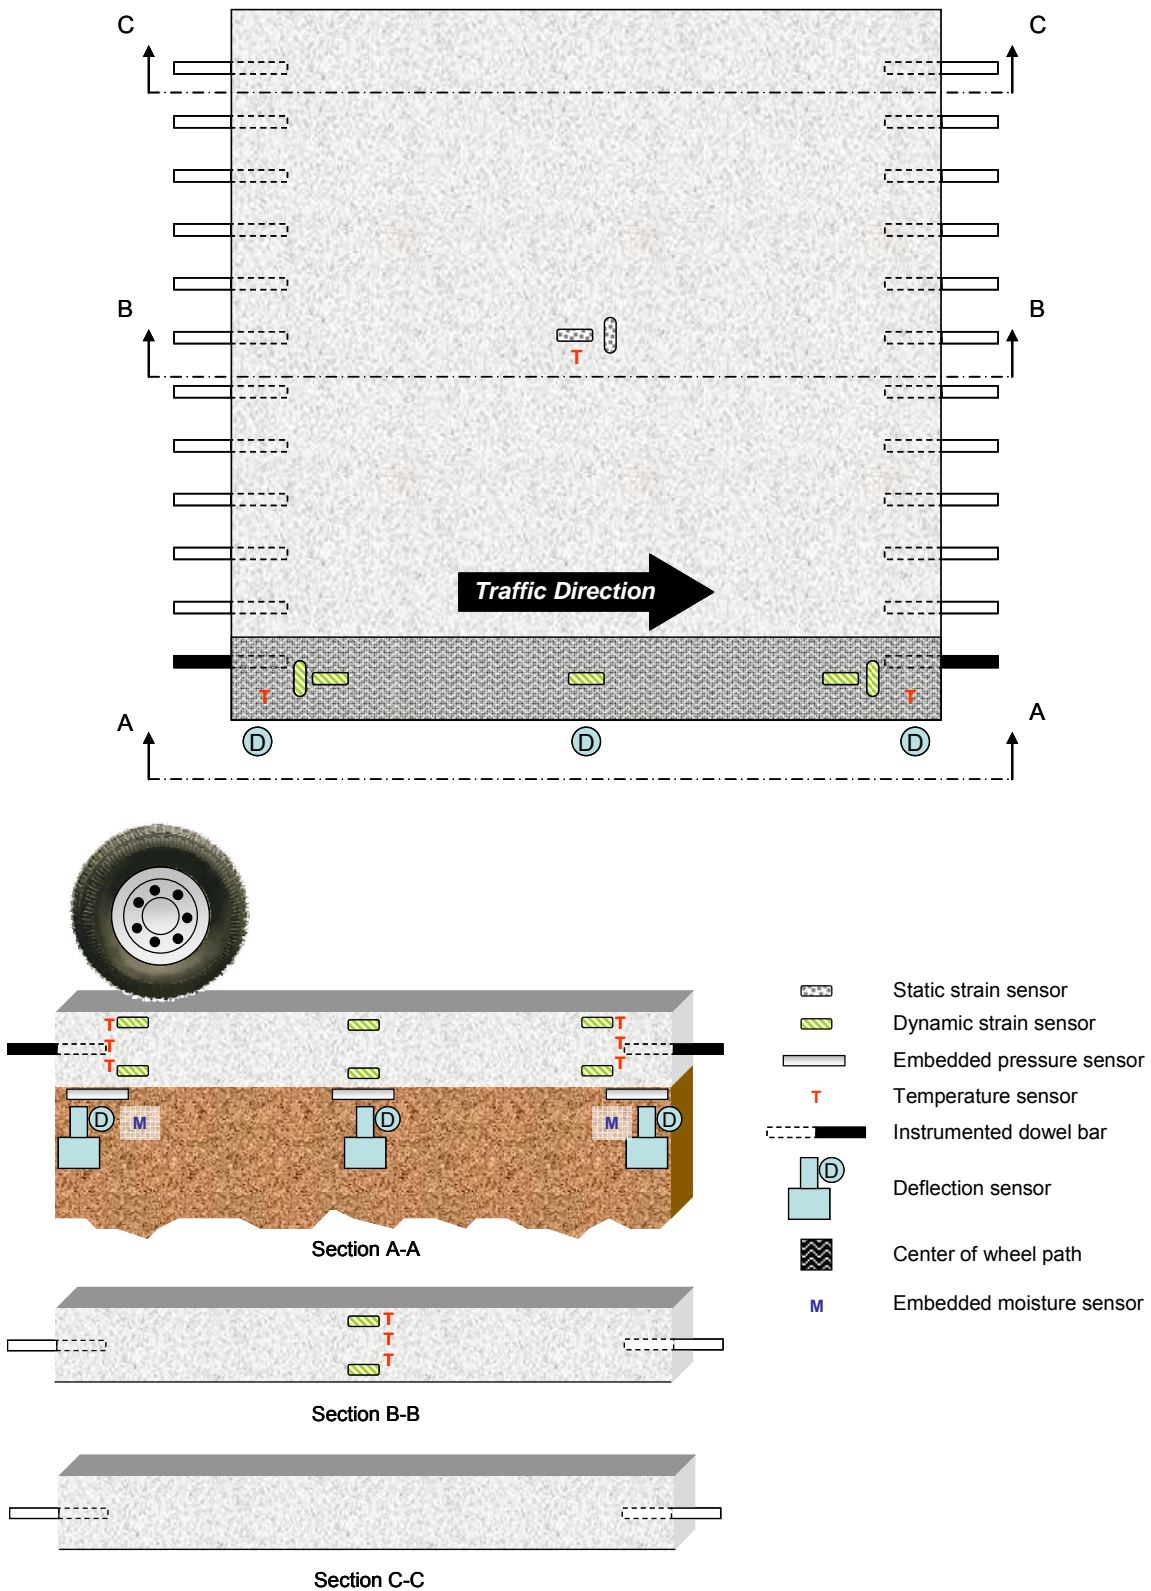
Illustration of an instrumented typical rigid pavement.
